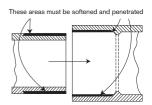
Solvent Cement Coatings of Sufficient Thickness Applied Uniformly around Pipe and inside Fitting Socket
